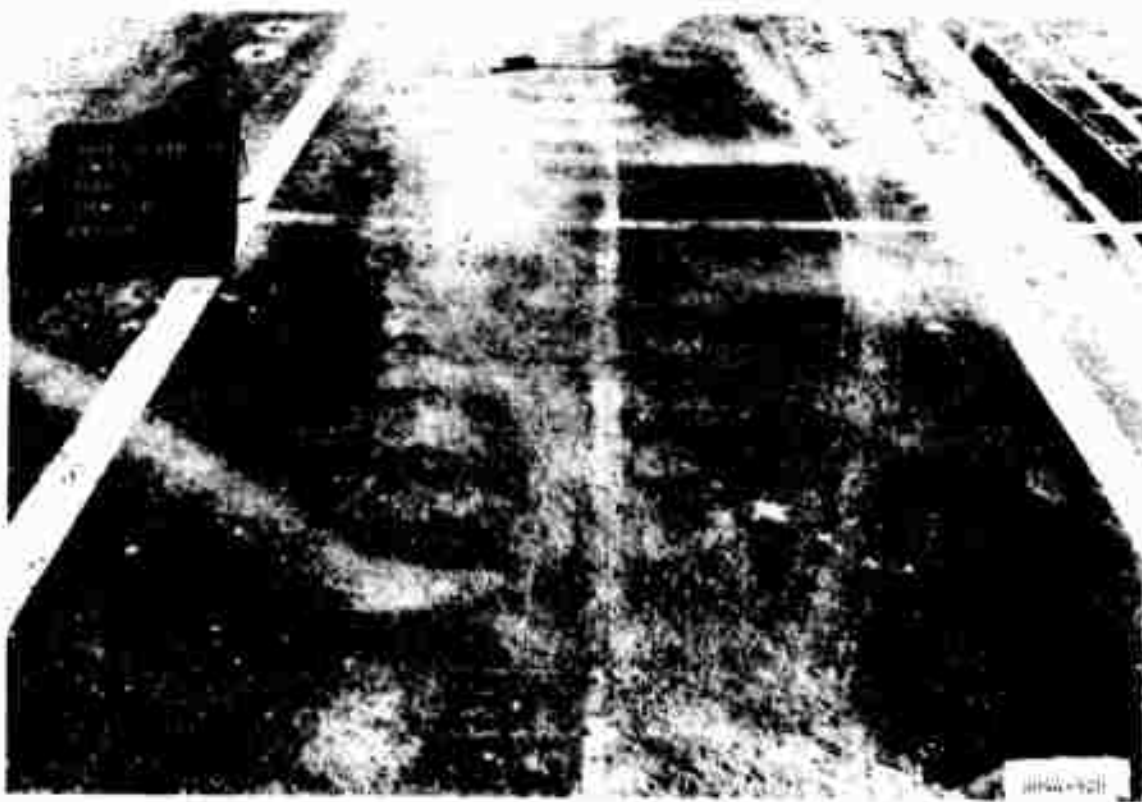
Subitem 5b, lane 3, flexible pavement test section, at failure after 240 coverages of 50-kip single-wheel assembly
